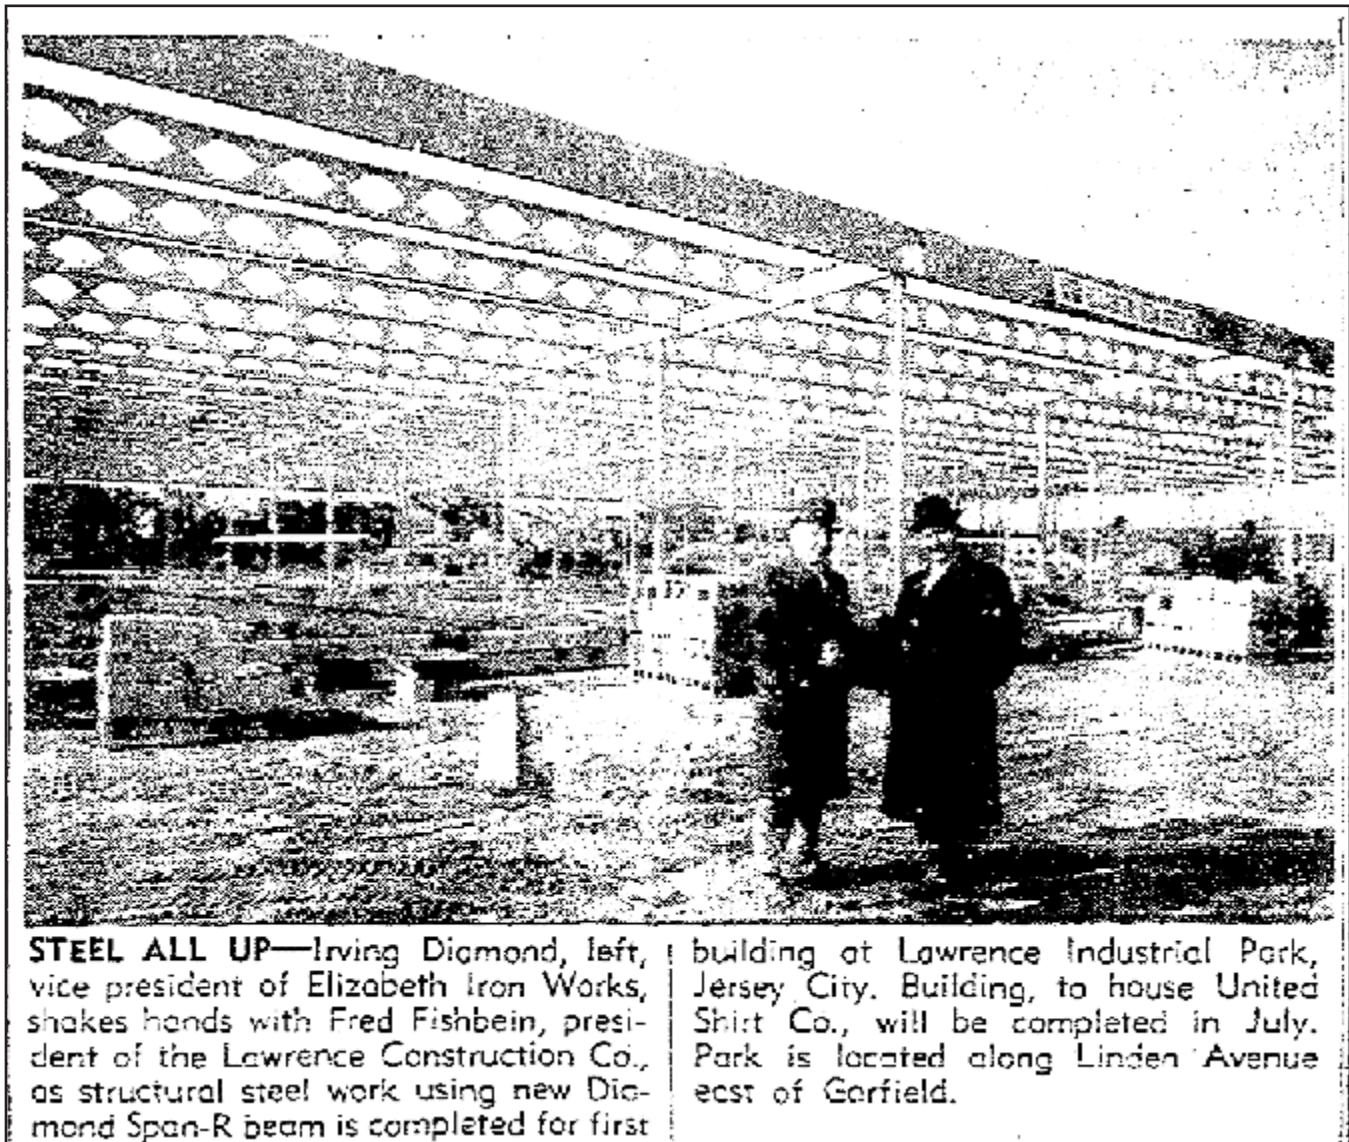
1960 photograph of the structural steel framing of the subject building at 15 Linden Avenue East during its construction phase (The Jersey Journal, 9 May 1960:2).
